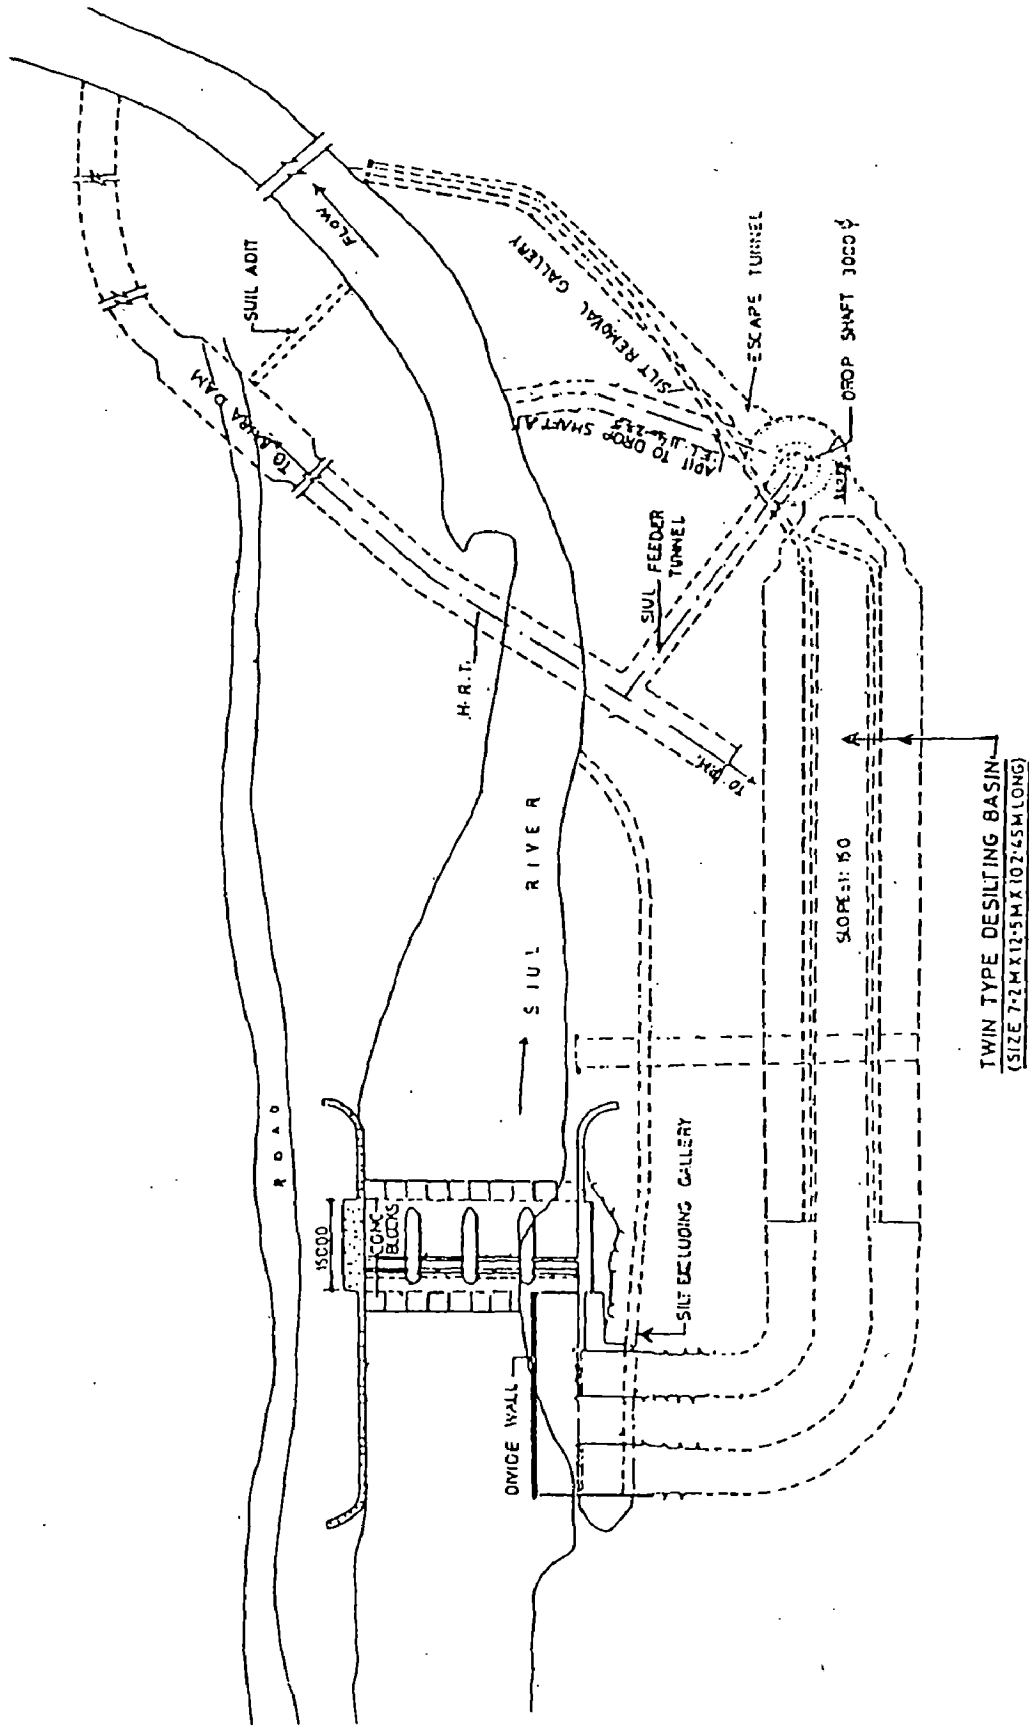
SIUL COMPLEX LAYOUT SHOWING DESILTING ARRANGEMENT
